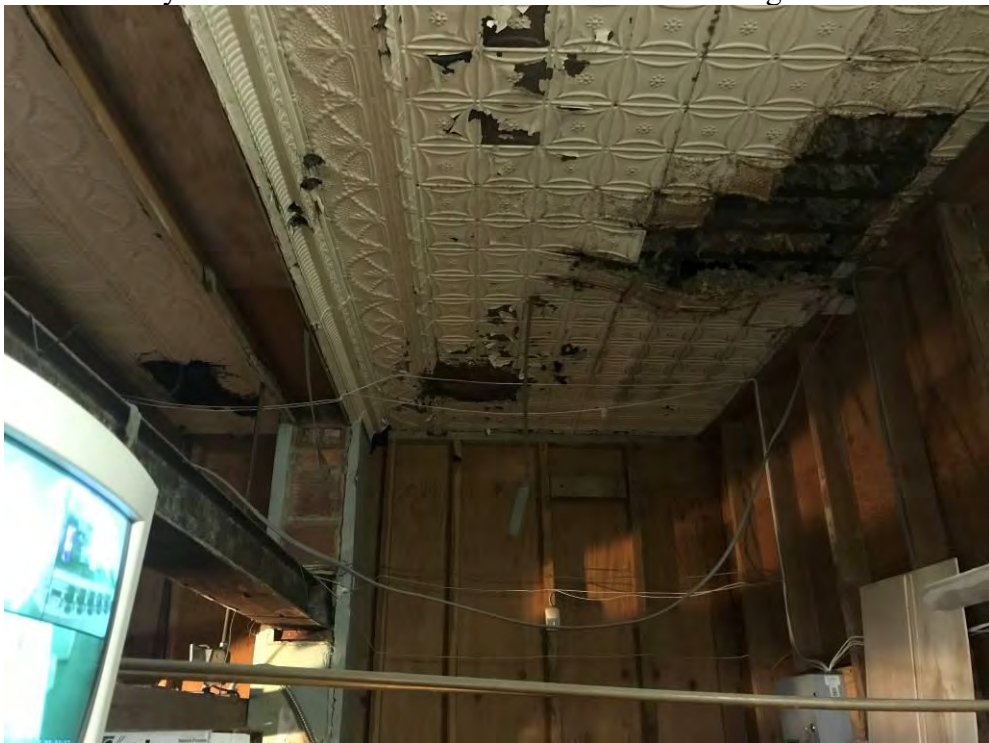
First Story Mechanical Space between West Area and East Area Looking North
